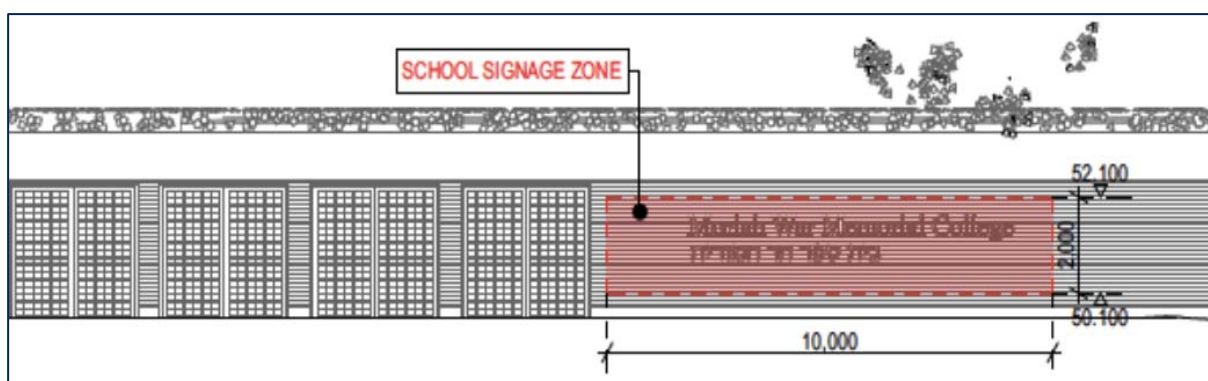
| Proposed signage zone – southern elevation (York Road) (Source: Applicant's SRtS)
